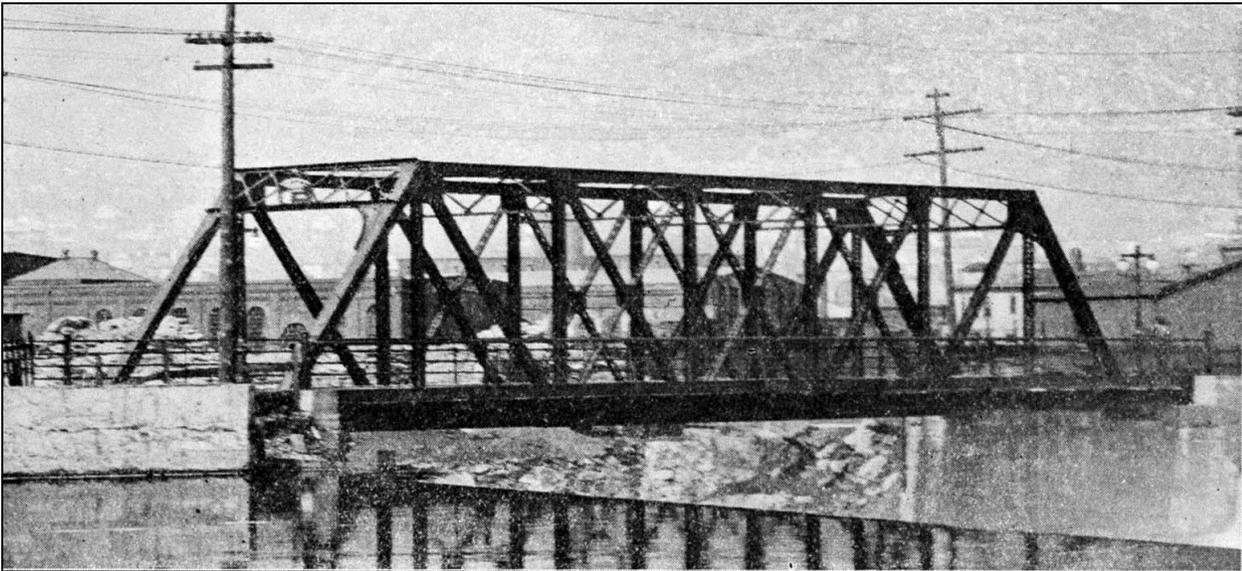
Amherst 186/107, "Cricket Corner Bridge" carrying NH 122 over Souhegan River. This single-span riveted high Pratt truss was built in 1912 by United Construction Co. Replaced in 1956. Storrs designed at least five high Pratt truss bridges in 1912. This one had seven panels, 14'-10" long, for a total length between the bearing pins of 103'-10". Photo August 9, 1940 (NHHD Bridge Inventory Card).
